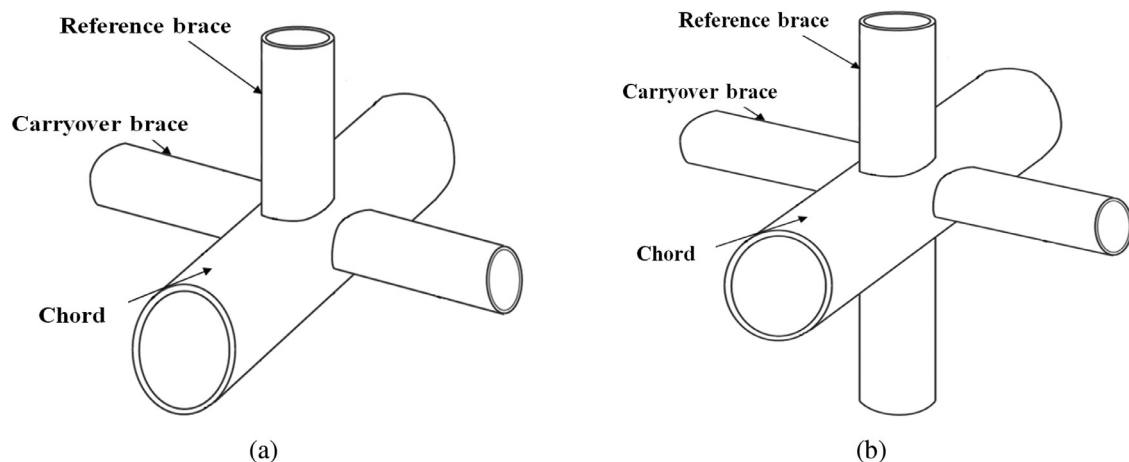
Example of multi-planar joints (CIDECT Design Guide No. 8 [4]): (a) multi-planar XT joint and (b) multi-planar XX joint.
